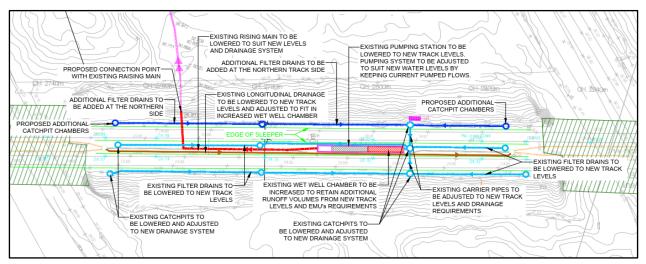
Proposed Drainage Upgrade Between OB08 and OB09
